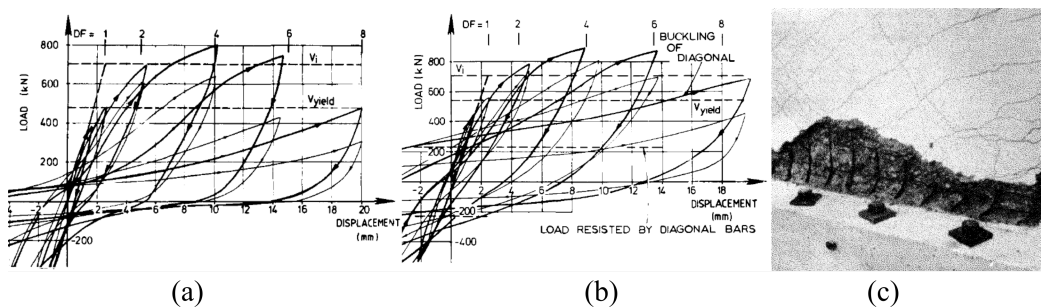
Load displacement curves of (a) Wall 1, and (b) Wall 2. (c) Sliding failure of Wall 1. Figures from Paulay et al. [33].
